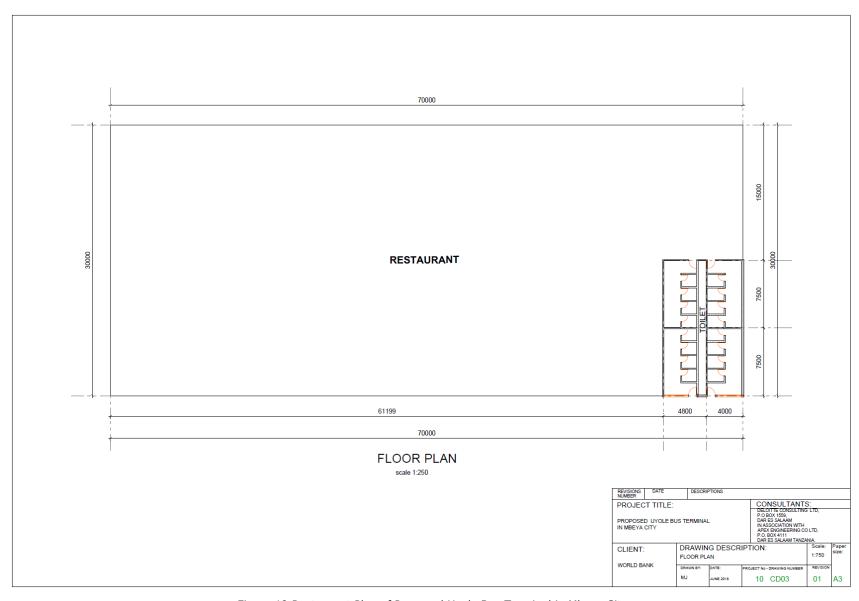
Restaurant Plan of Proposed Uyole Bus Terminal in Mbeya City
